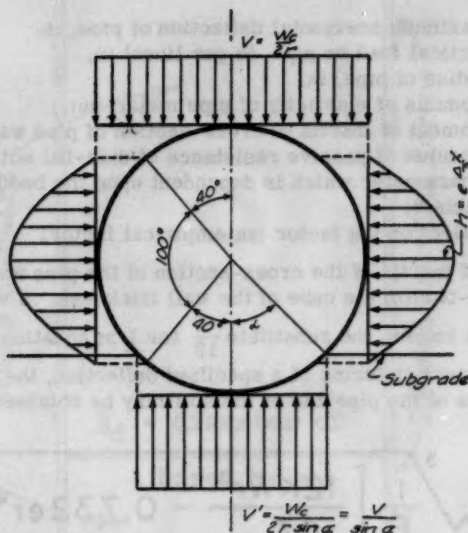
Assumed Distribution of Pressure on Flexible Culvert Pipes
